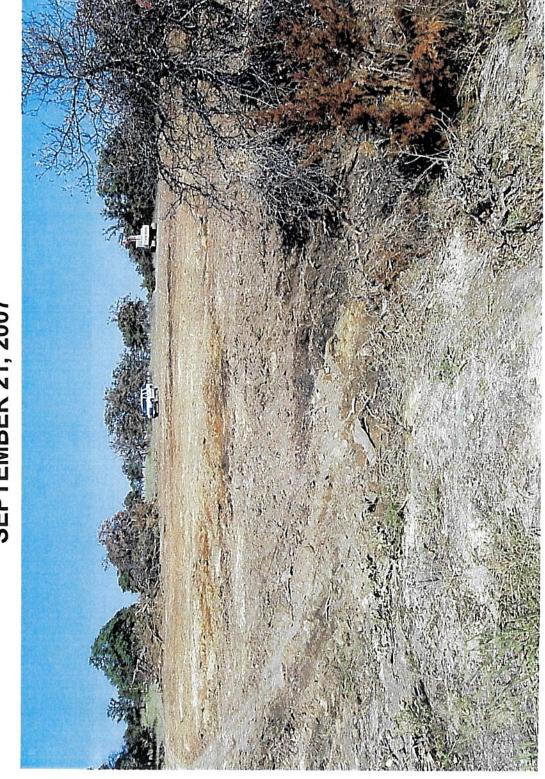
taken east. Reverse angle photo from creek entry point showing wet ground from seeps and size of drilling location.
